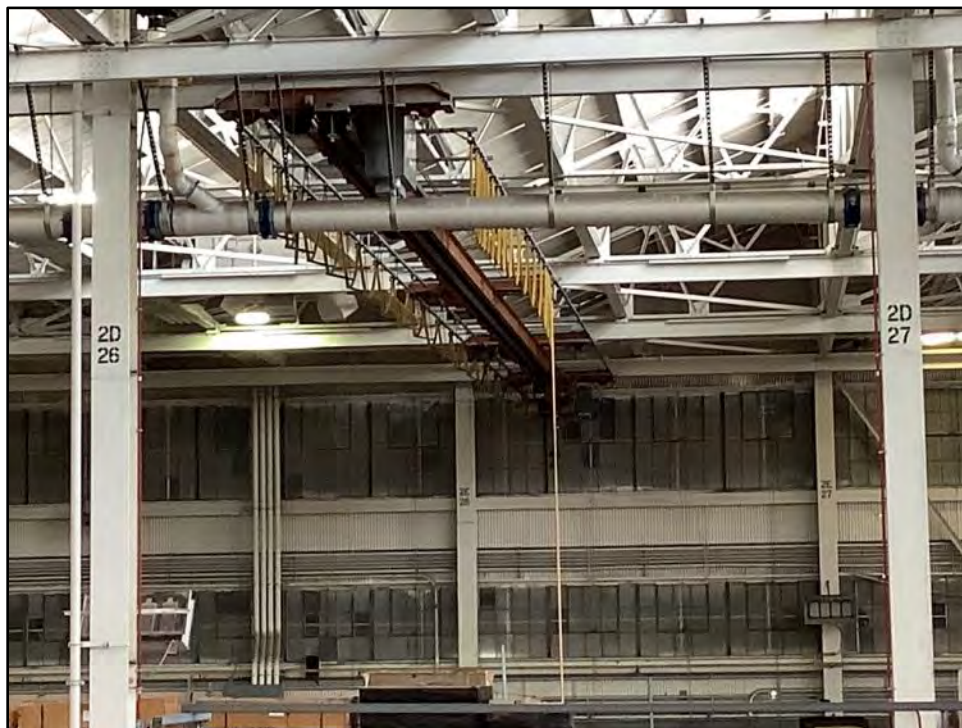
Building 2, Intact Typical Side Wall Steel Windows. View toward the southwest.
